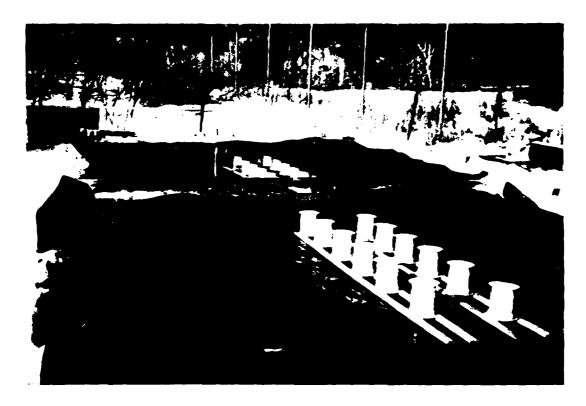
Forms for reg-set concrete test slabs, Hanover, NH.
